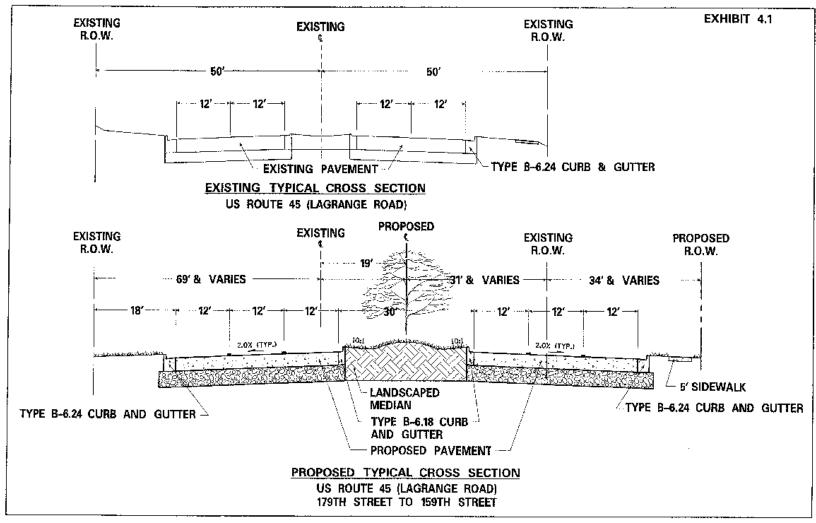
Existing and IDOT Proposed Typical Cross Section, 159<sup>th</sup> Street to 179<sup>th</sup> Street
